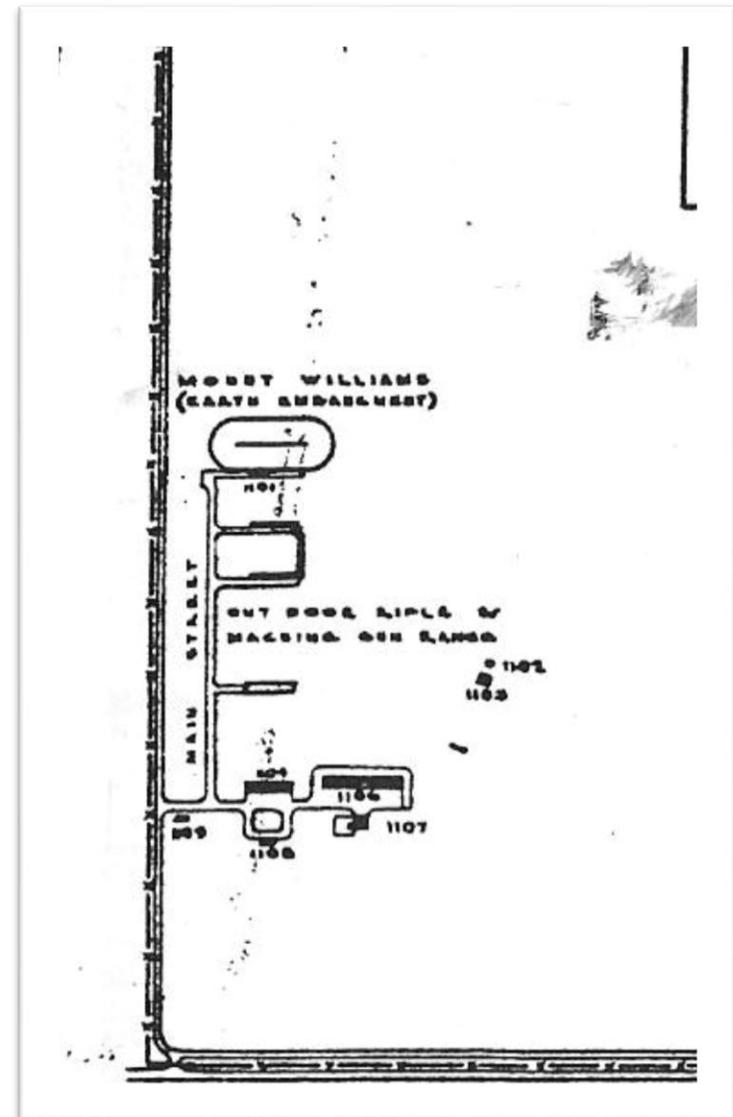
Detail of 1943 US Navy plan of NNAS showing Perimeter Road, internal roads, Mount Williams and the Outdoor Rifle and Machine Gun Range.
